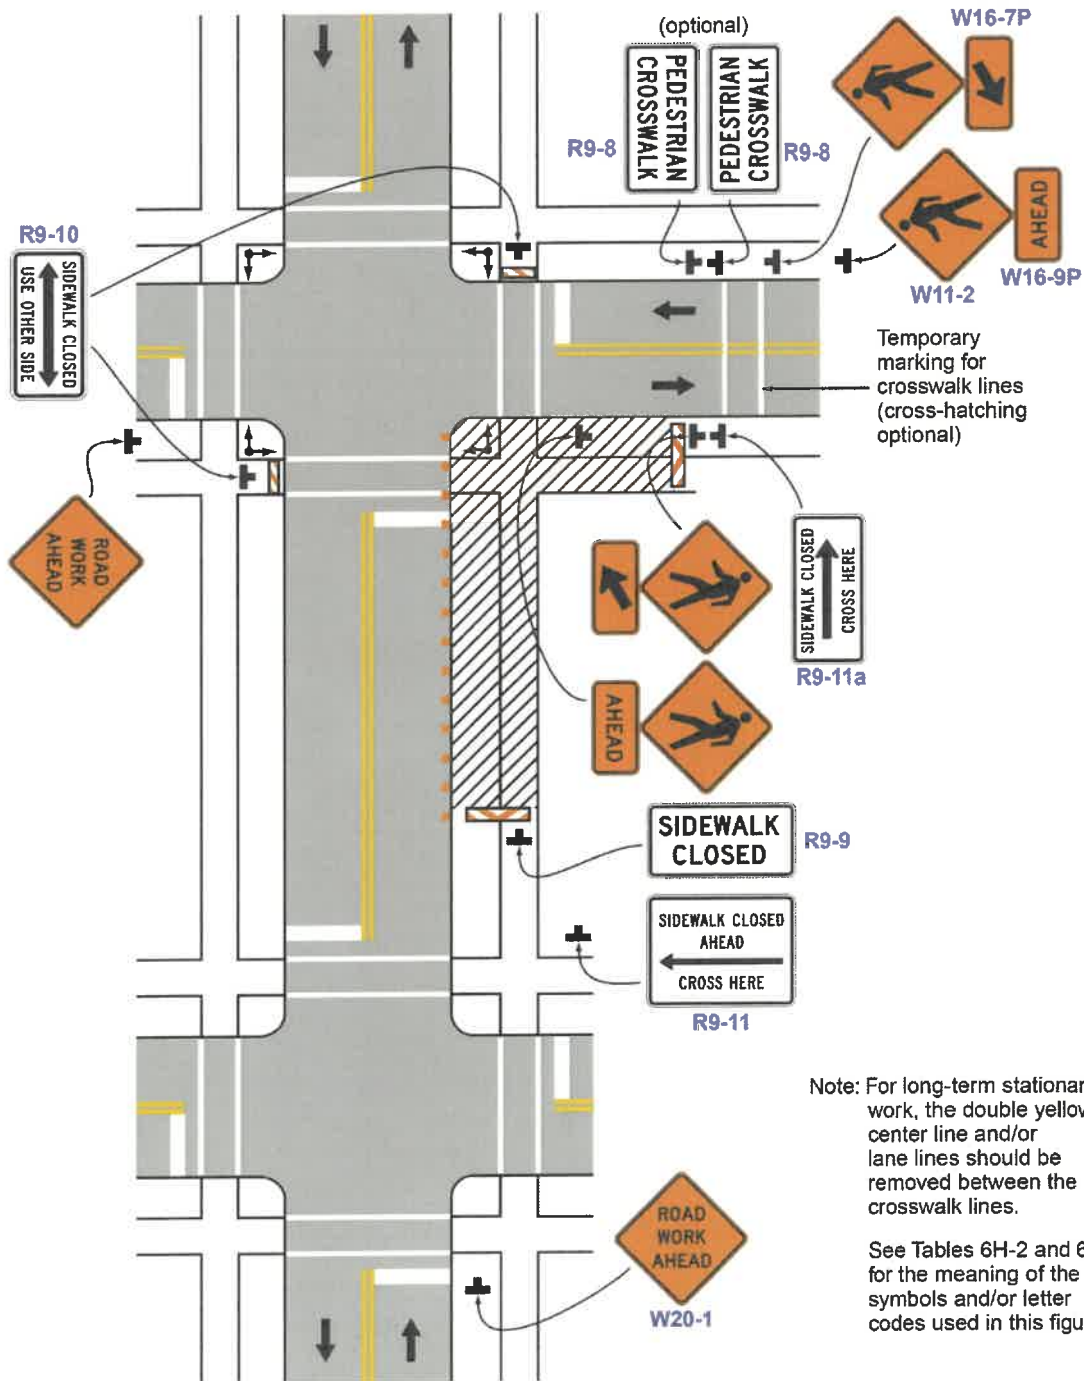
H-28. Sidewalk Detour or Diversion (TA-28)
